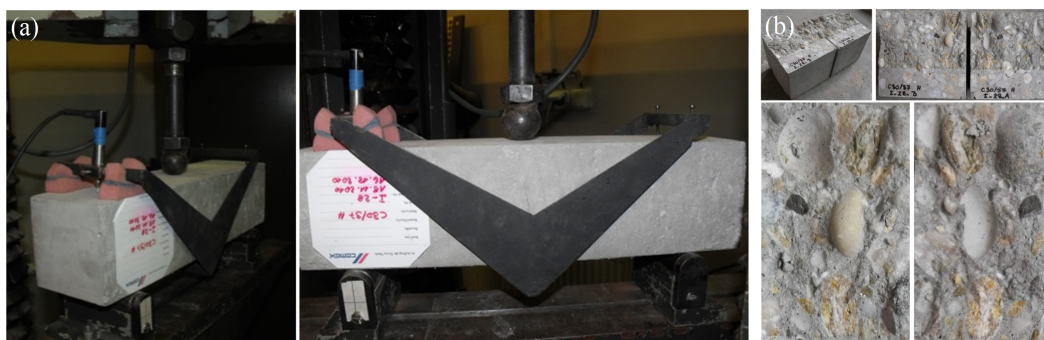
(a) Selected specimen tested in a three-point bending configuration and (b) the fractured parts/surfaces after testing
